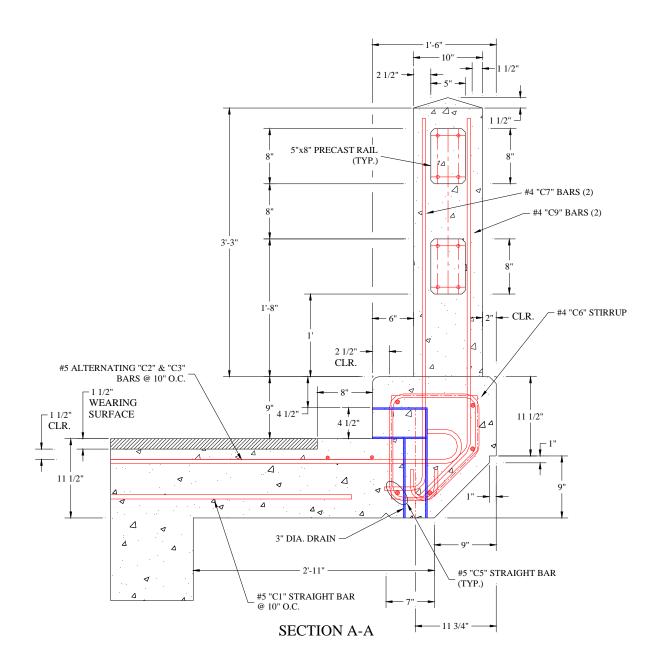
Details of US 11 Bridge over Lake Pontchartrain Bridge Rail (continued).
